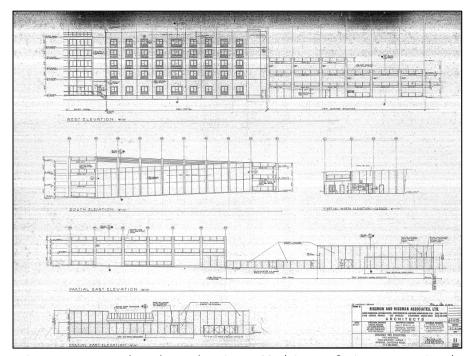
West, south, and east elevations, 1984 (Rissman & Rissman Associates)
